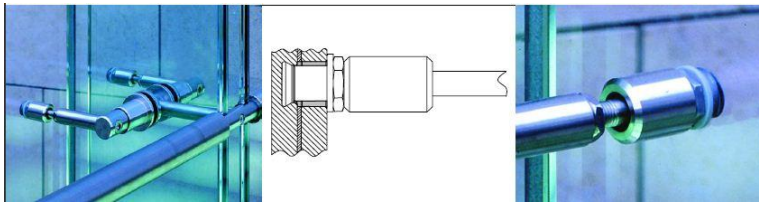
Detail of bolted glazing (point fixing) (Fischer Company, 2006).
